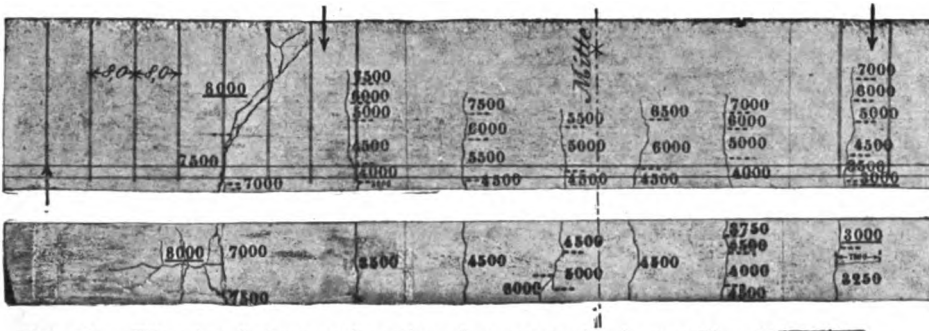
Side view, bottom, and section of a rectangular beam with straight reinforcement and with stirrups.
